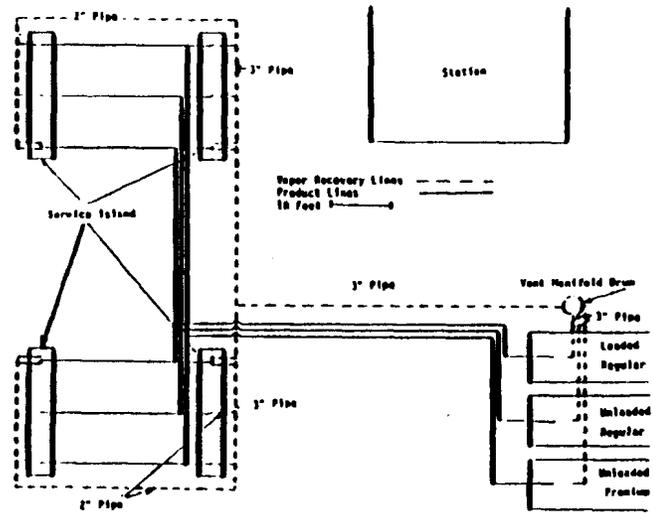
Stage II Underground Piping Layouts for Model Plant A
